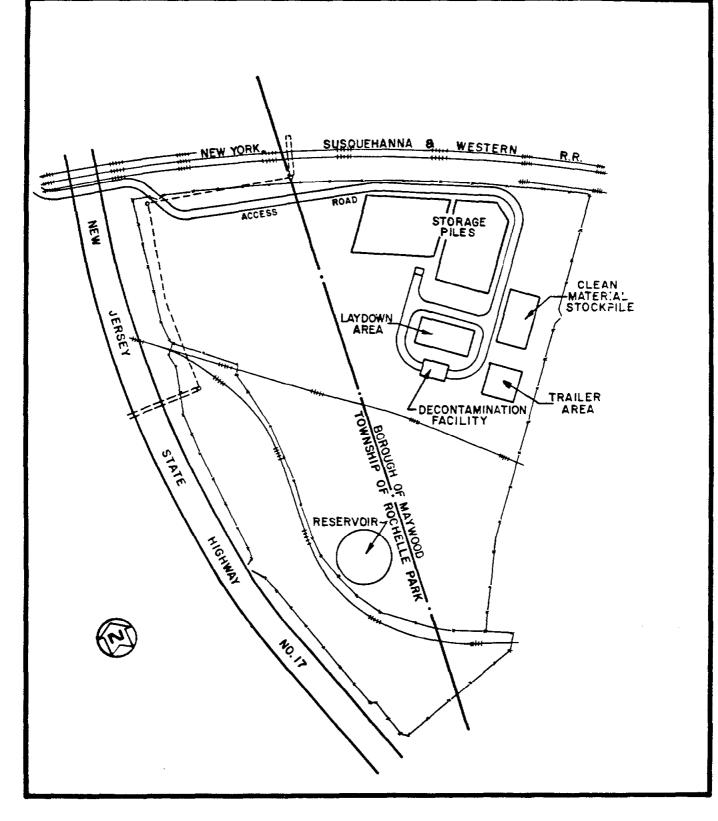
PROPOSED STORAGE PILE AT THE MISS
